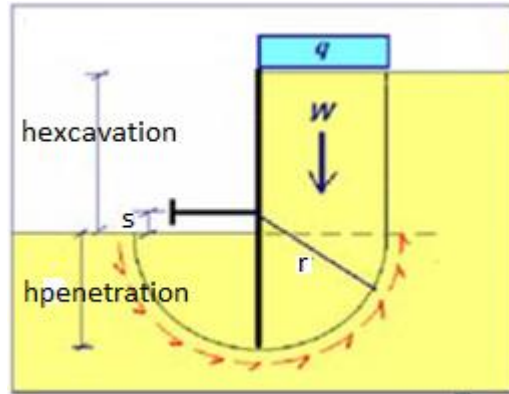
Schematic Basal heaves (retaining wall with probe) [4]
